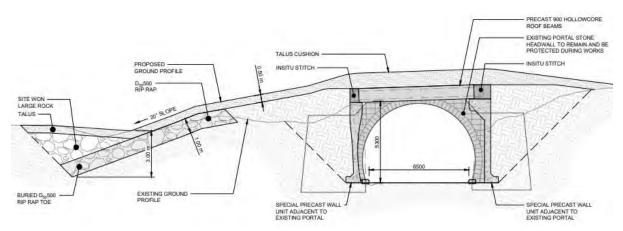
Cross section view (at the portal) indicating the sloped embankment
